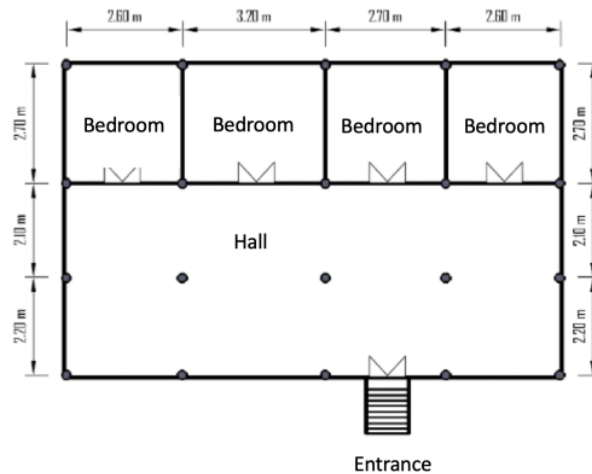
Layout of Gadang Tiga House (source: Abdullah et al., 2015)
